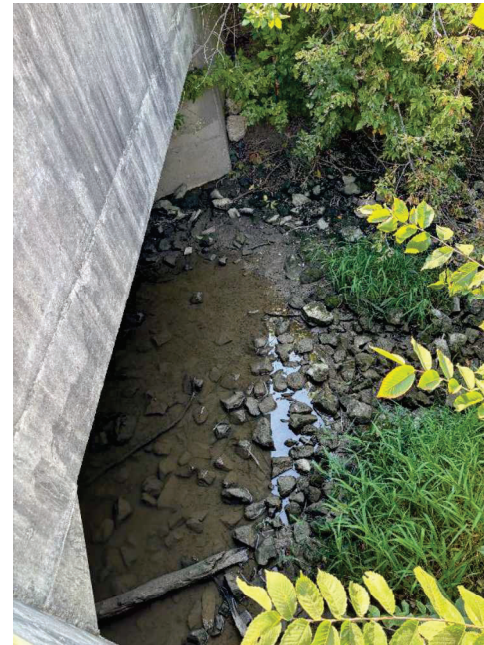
Outlet of Crossing 9, north side of County Road 46, facing west.
